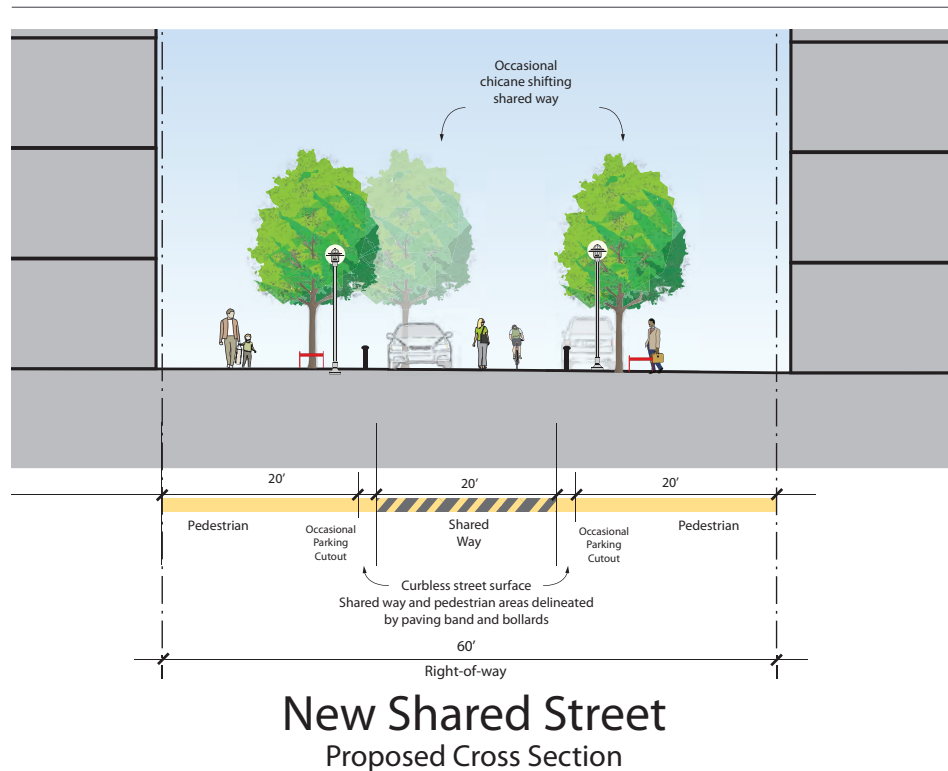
PROPOSED CROSS SECTION OF A NEW SHARED STREET
